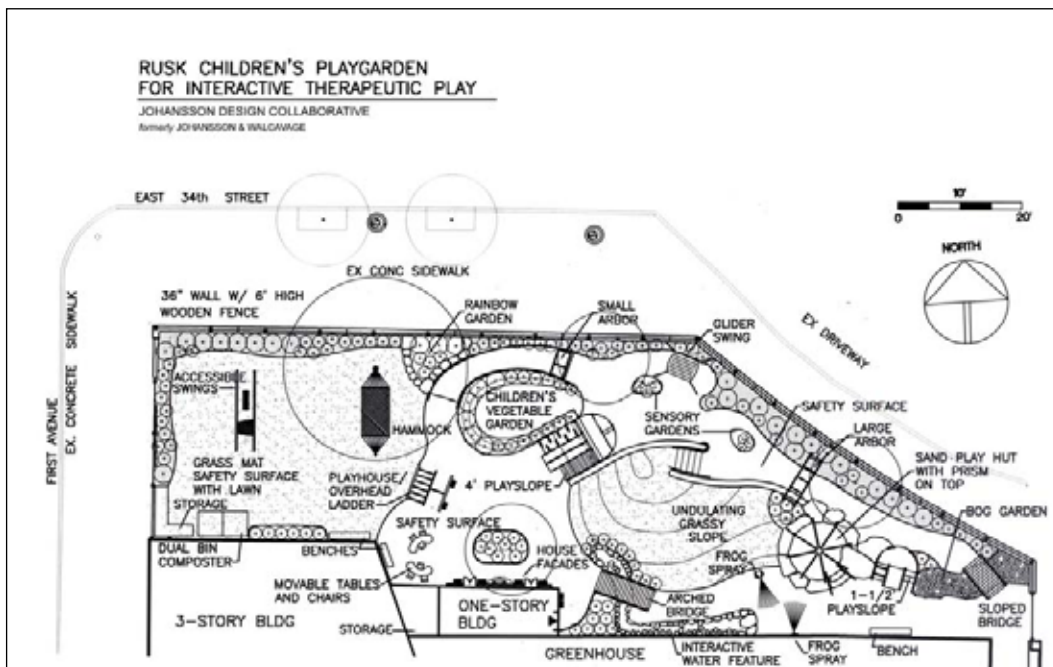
Rusk Plan by Johansson Design Collaborative (formerly Johansson & Walcavage) developed in collaboration with the therapists.
